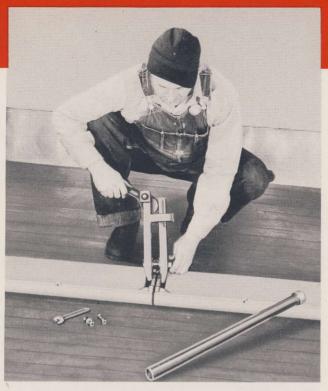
Tool for assembling Radiant Baseboard Panels.
